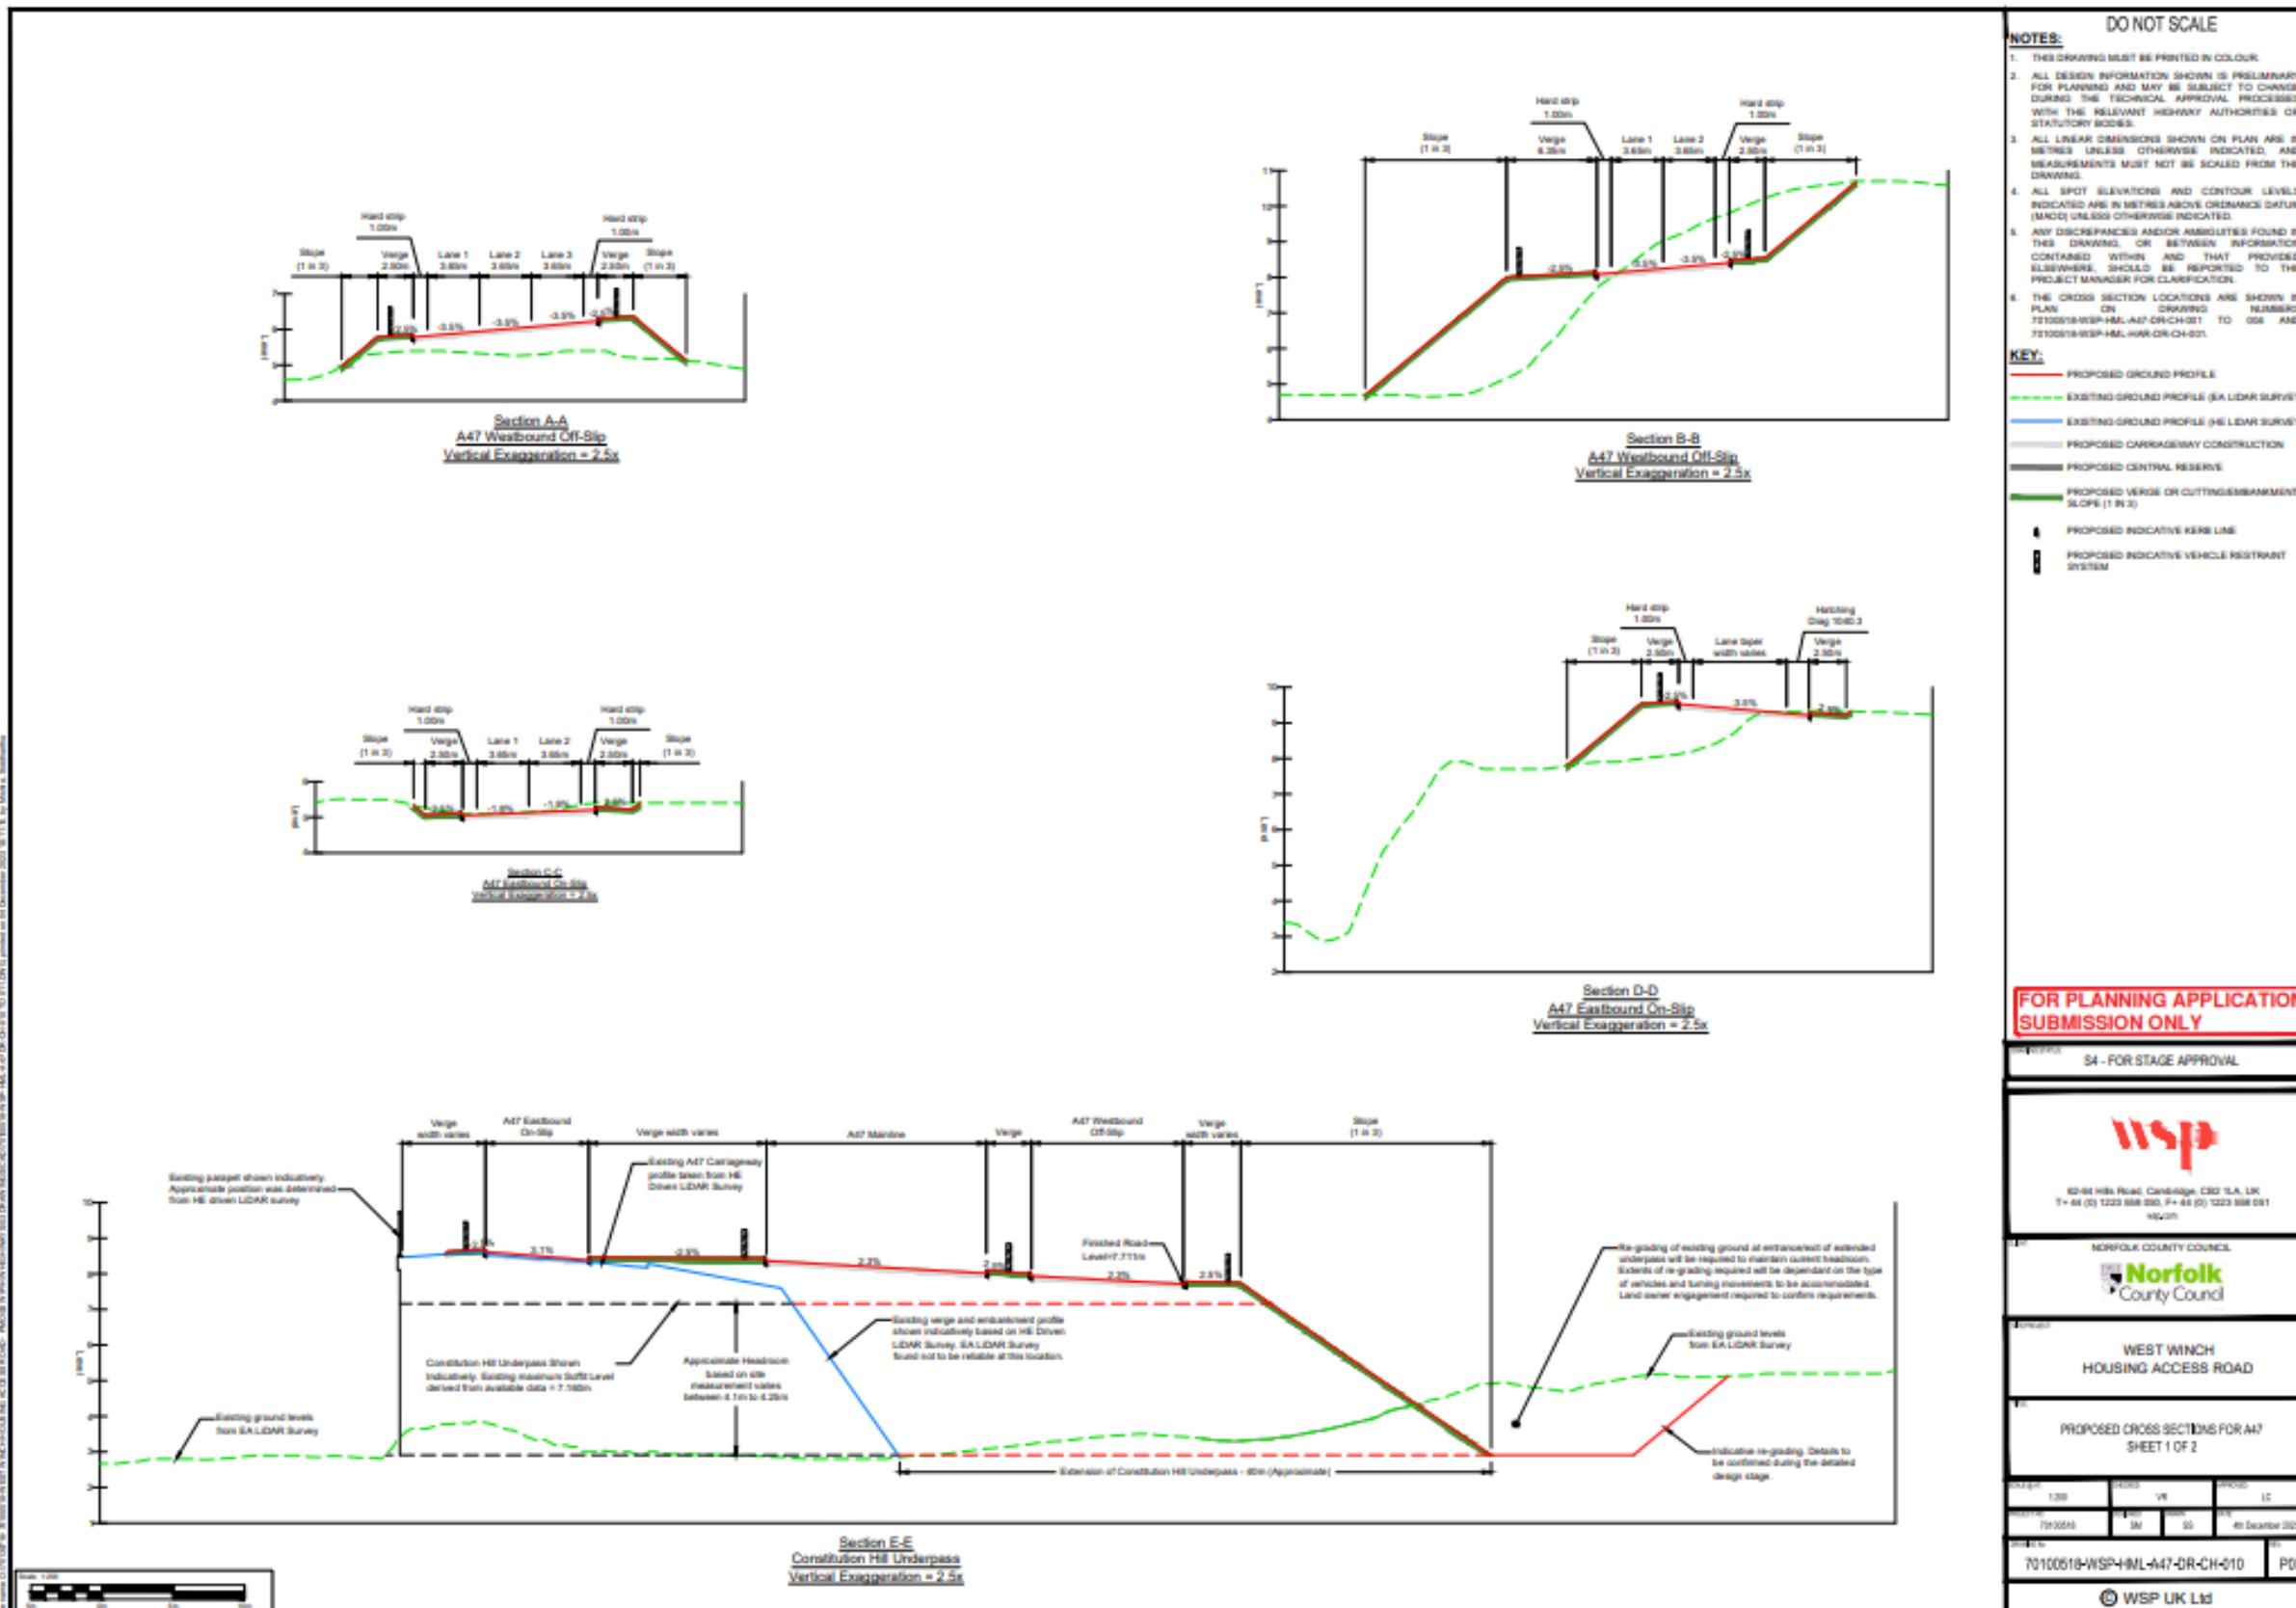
Cross Sections Drawings For A47 (Sheet 2 of 2)
